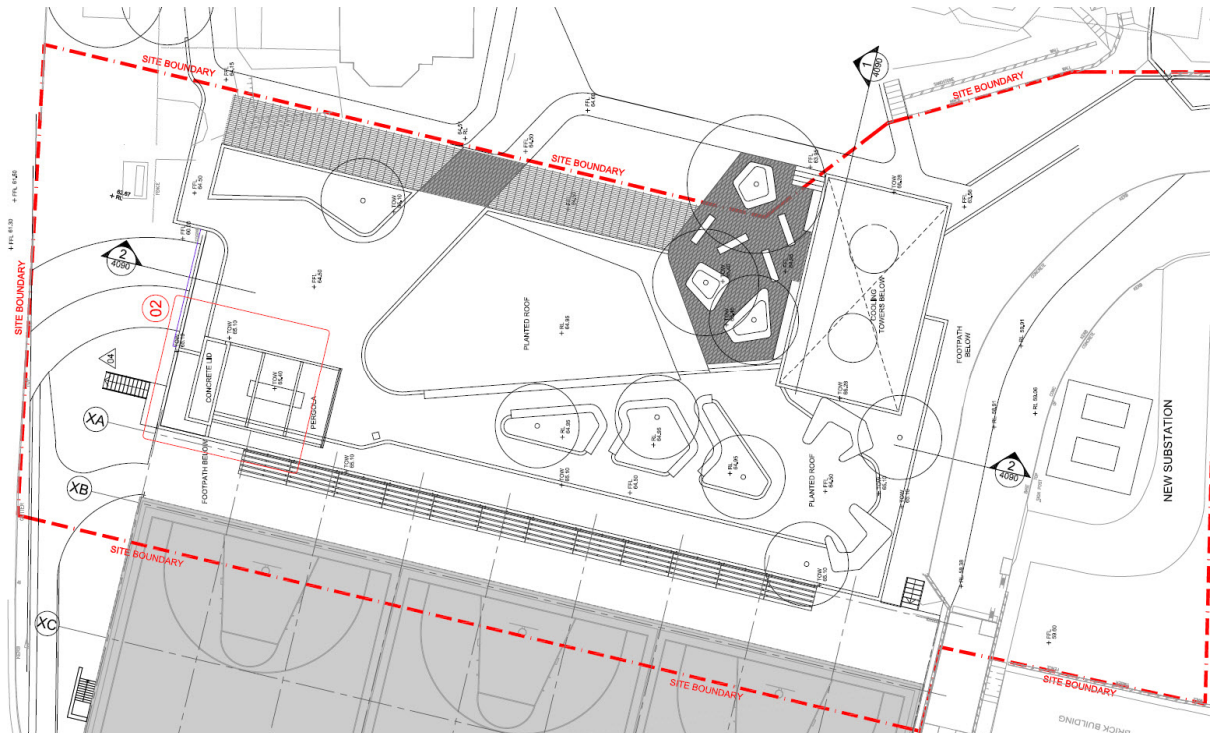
PROPOSED General Arrangement Car Park Roof Top (Source: COX, Revised A-DA-2192, Revision 05)
